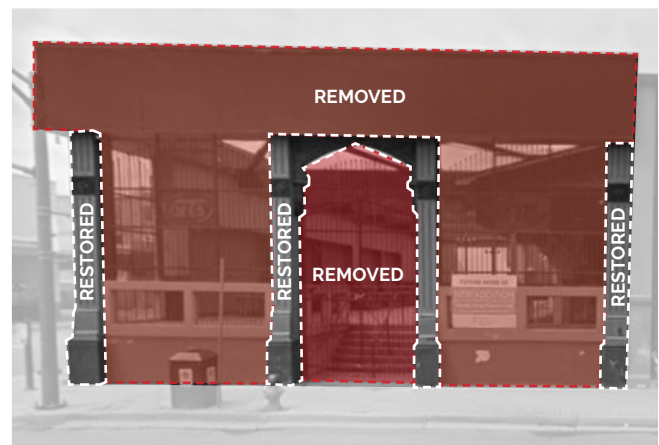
329 Richmond Street Changes, East Elevation
